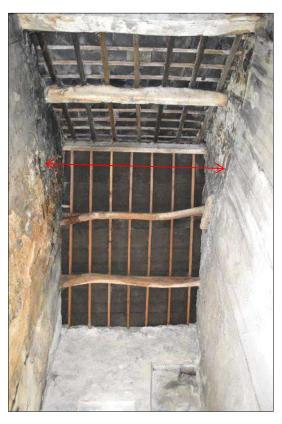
(shot 128): Purlin roof structure and niche or blocked opening on the southeast wall, first floor level, notice the lack of thick plaster on the gables, see arrow, looking southeast
